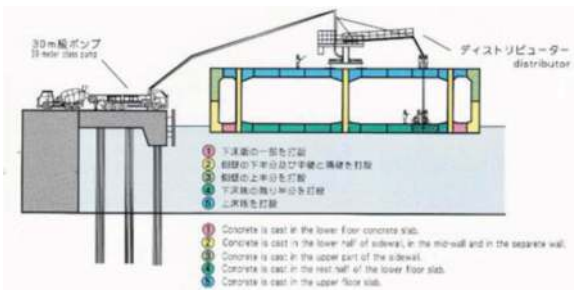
Casting of full sandwich immersed tunnel element in floating position.
